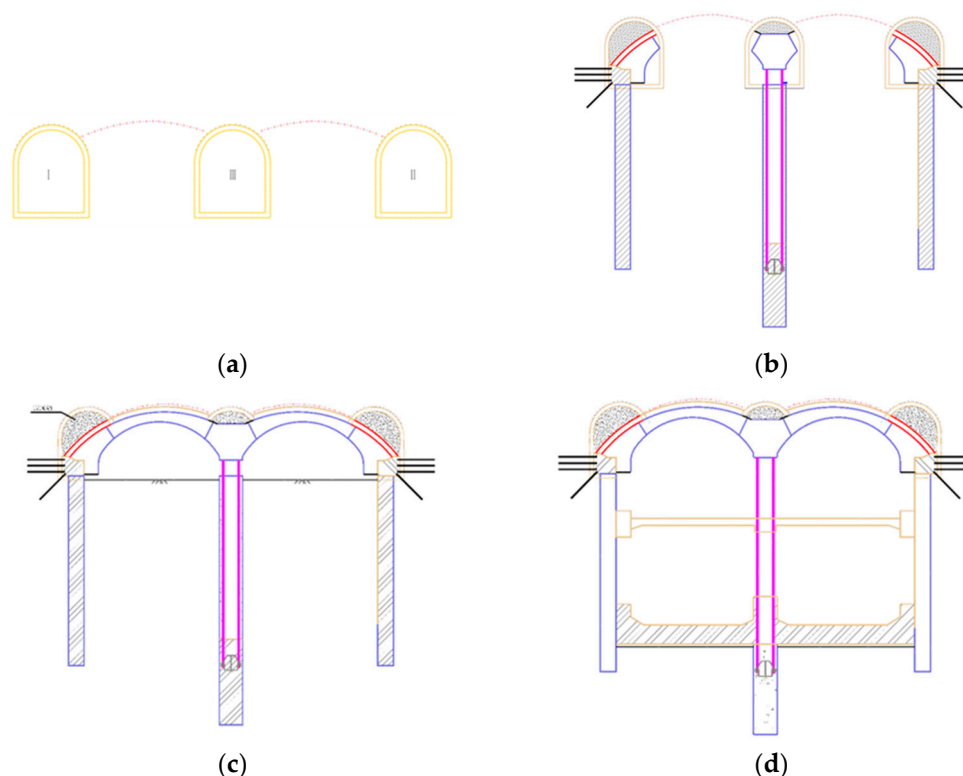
Construction process (a) Construction of the pilot tunnel; (b) Construction of pile beam; (c) Construction of the top arch; (d) Main body construction.
